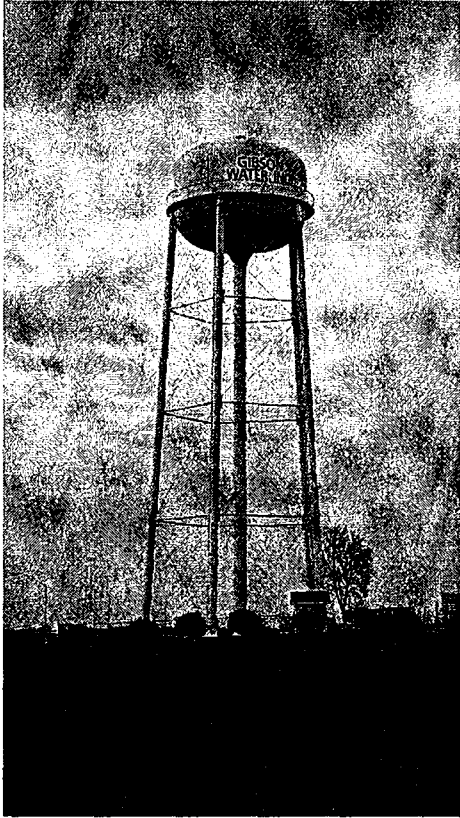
300,000 Gal. Elevated Tank (On U.S. 41 west of Toyota Manufacturing)
